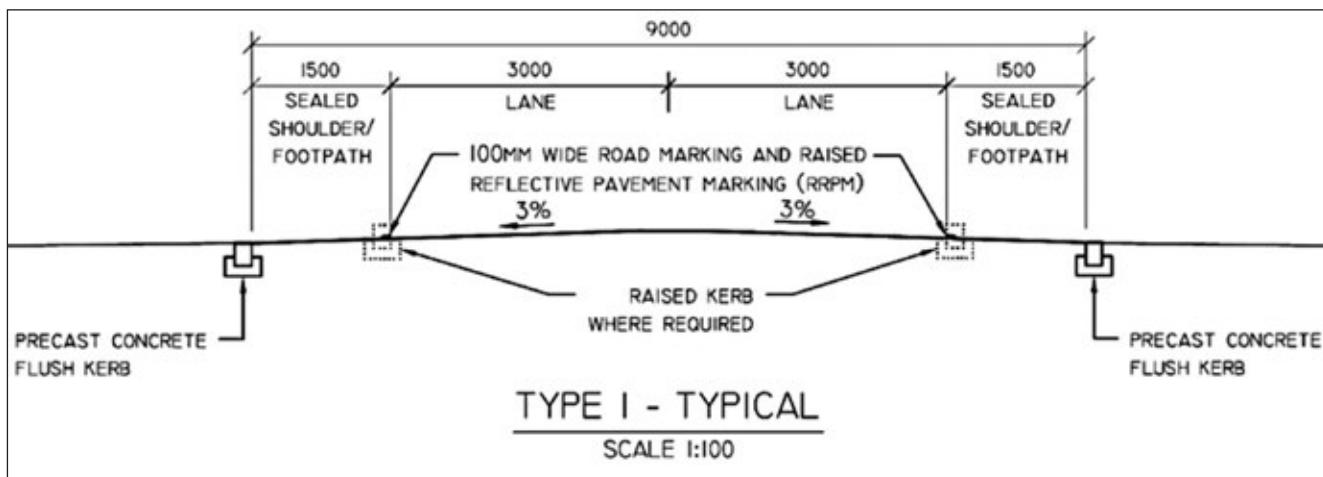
Typical road cross section for KRRP - Betio to Bikenibeu (Roughton International, 2011a)
